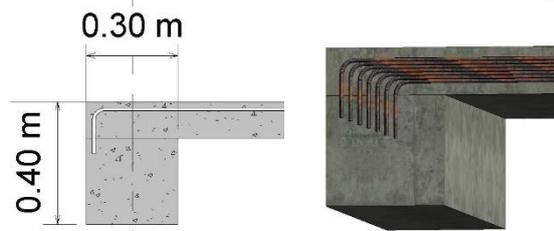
Bar details at beam-column joint for bar development examples (3D Views).
